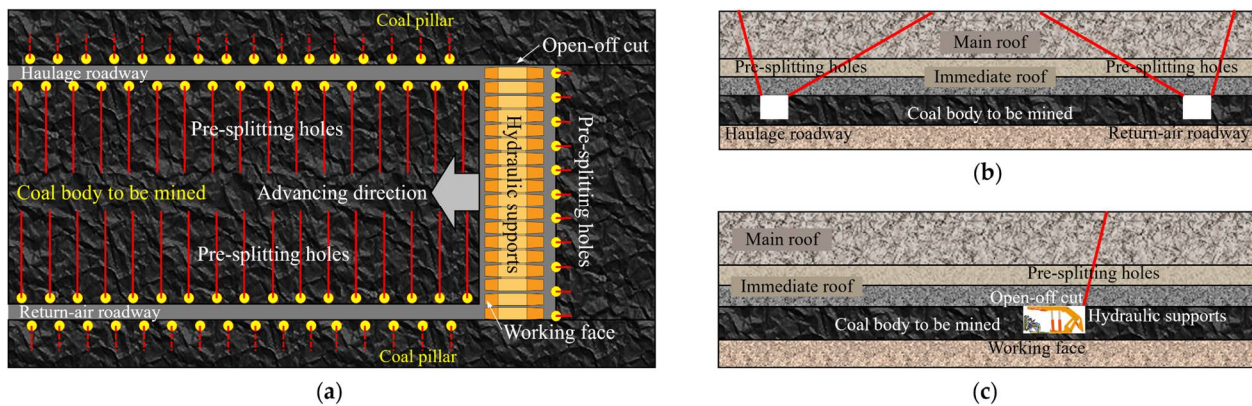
Fracturing operation of the thick and hard main roof. (a) Plane diagram of pre-splitting drilling hole (b) Side view of boreholes in roadway (c) Side view of boreholes in the open-off cut.
